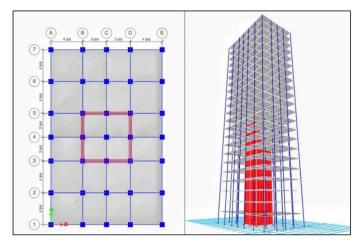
Plan of Structure Inner/Core Middle Shear Wall
